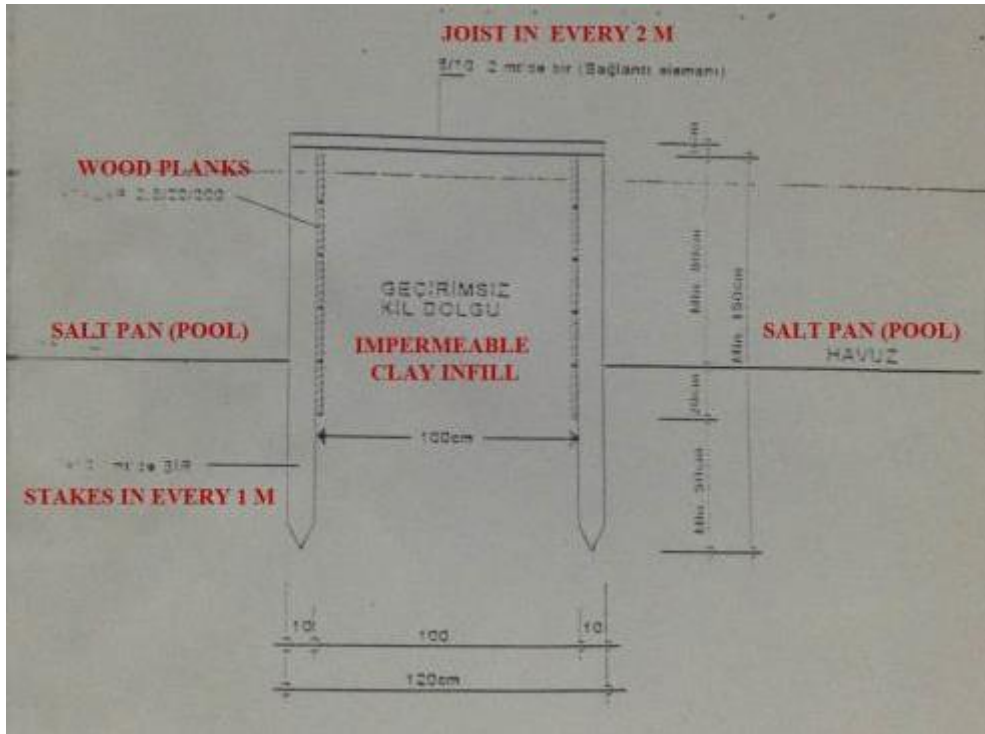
Section of a border between two pools (TTA Gayrimenkul Archive)
